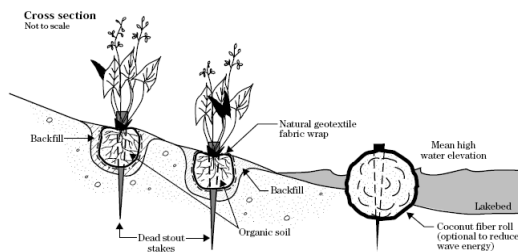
Typical reed clump project cross-section (USDA, 1996).
